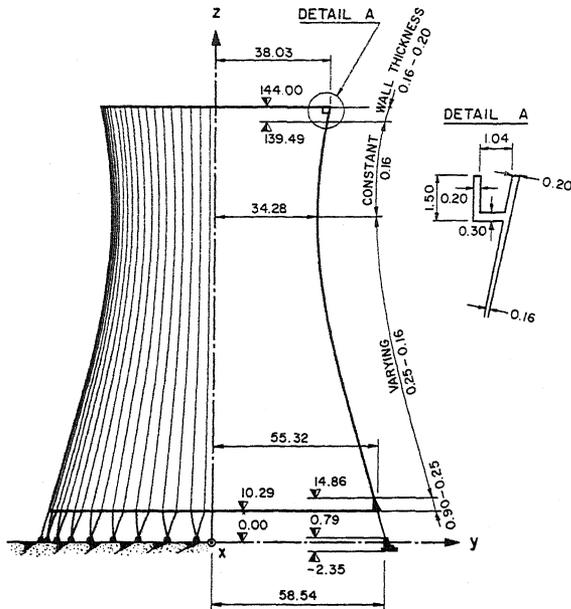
Natural-draught hyperbolic cooling tower Leibstadt [m]
